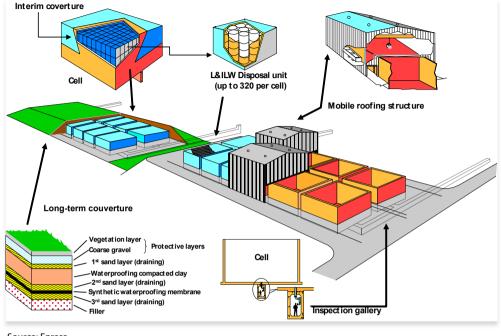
Concept of L&ILW disposal facility at El Cabril
